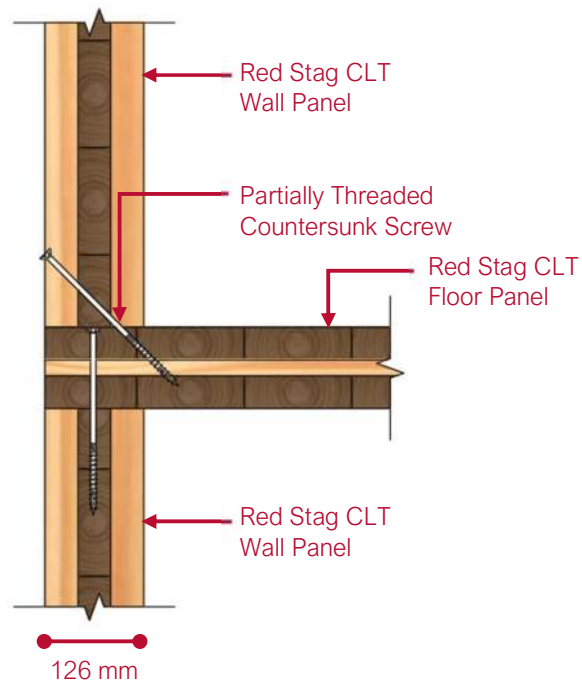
Red Stag CLT wall panel to CLT floor panel.
